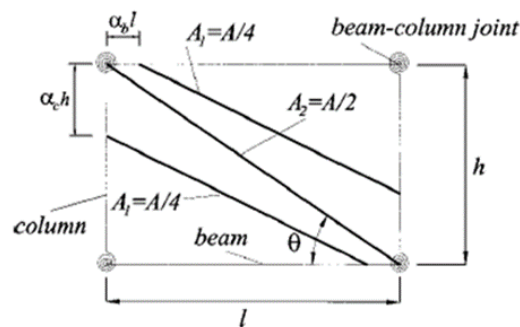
Proposed model of masonry infilled steel frame Wael W. El-Dakhakhni (2003)
